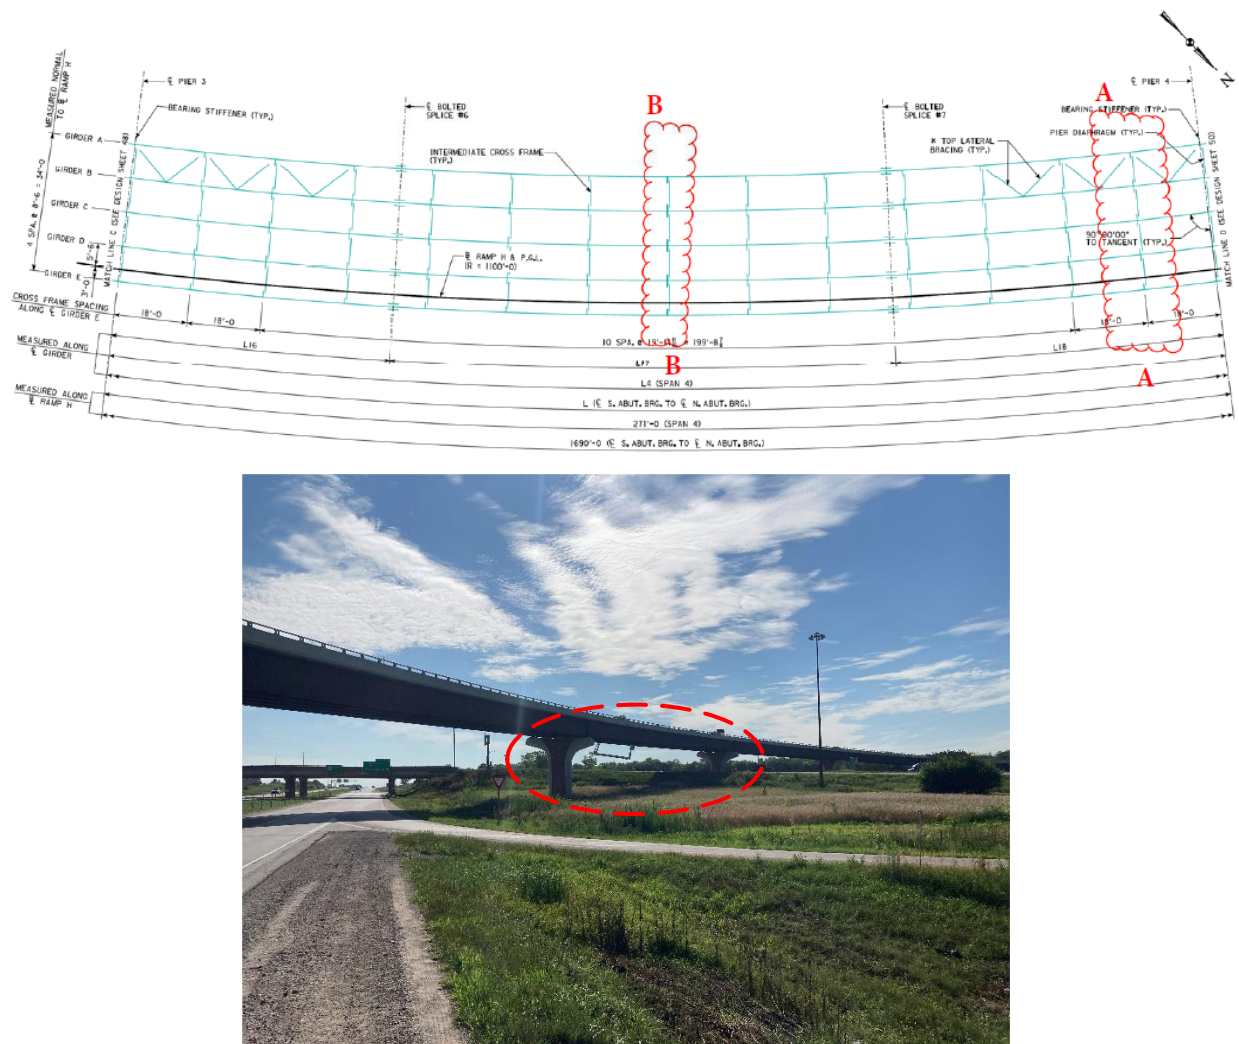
Structural steel framing plan for a section of Span 4 with the instrumented cross-frames highlighted (top) and a photograph of the instrumented span (bottom)
